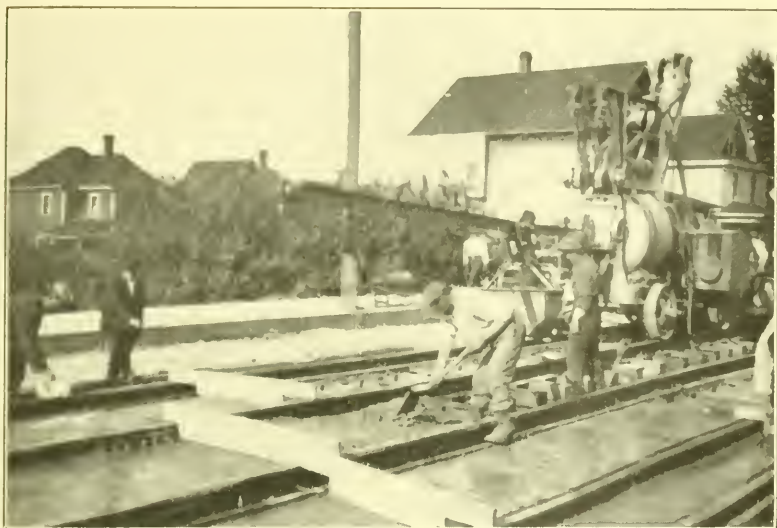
BRINGING CONCRETE TO UNDERSIDE OF PAVEMENT, BROADWAY, VAN-
